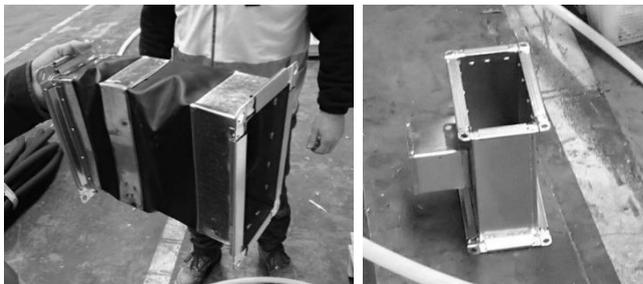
Rectangular duct joint for coupling distribution ducts with big tolerances (left); b) T-branch accessory to connect consecutive modules and with the duct net in the dwelling (right)
